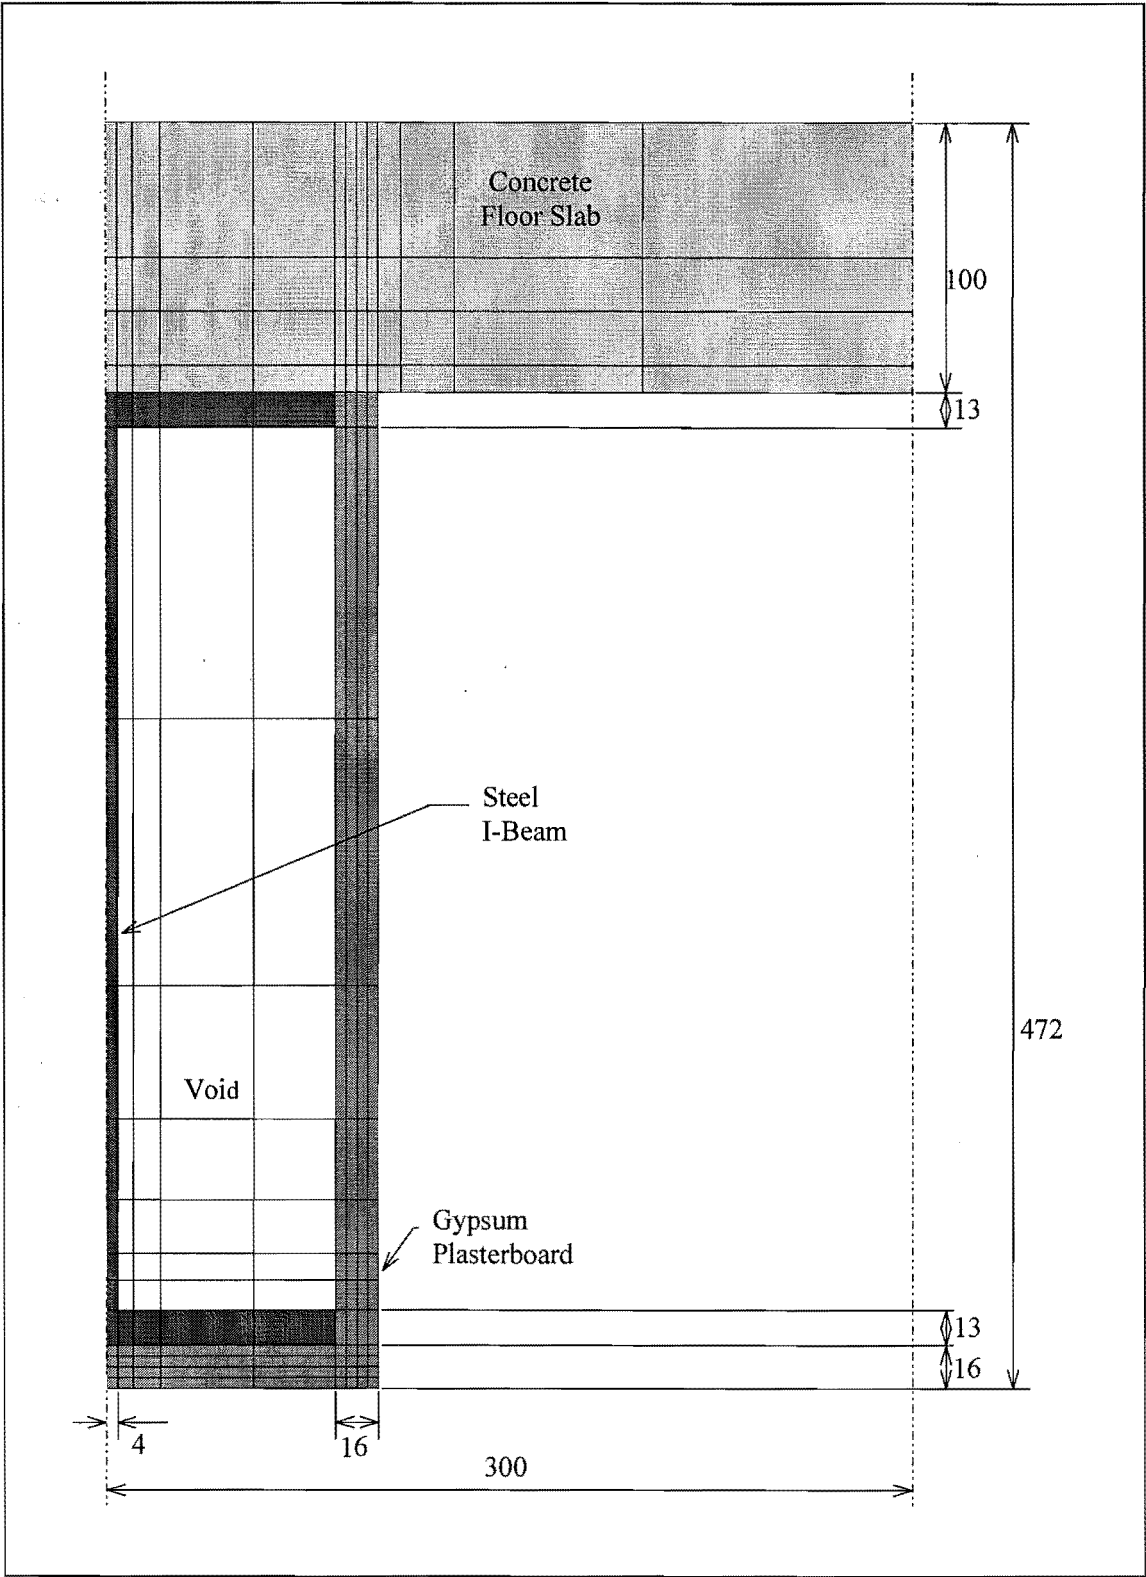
Layout of Structural Steel Beam and Concrete Floor Slab
